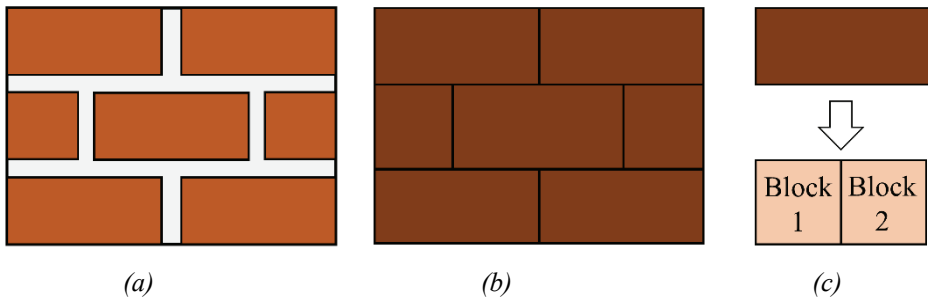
Representation of masonry wall within the DEM framework; (a) a masonry wall texture, (b) SMM realization and (c) potential crack line (or surface in 3D) for a single block in DEM.
